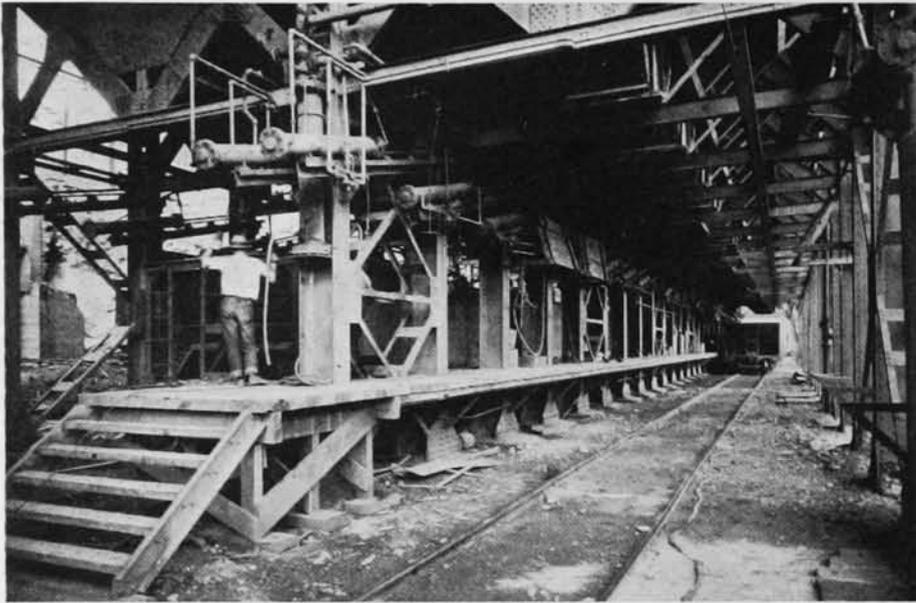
Outside Transfer and Storage Bins, Hopewell Tunnel
